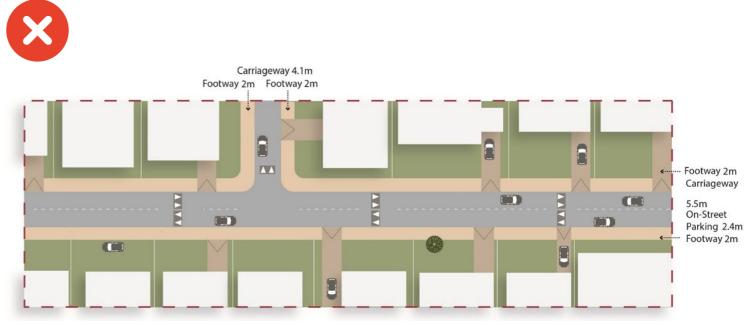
Street Typology Plan for a Poorly Designed Residential Link Street in a Rural Context
